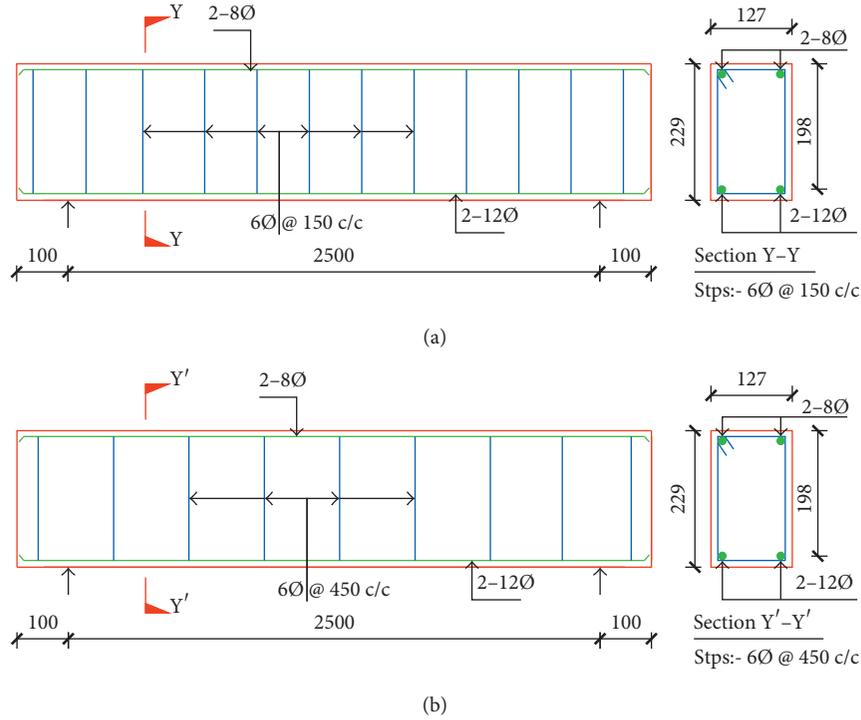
Beam section and reinforcement details: (a) shear-designed beams (DBs); (b) shear-deficient beams (SDBs).
